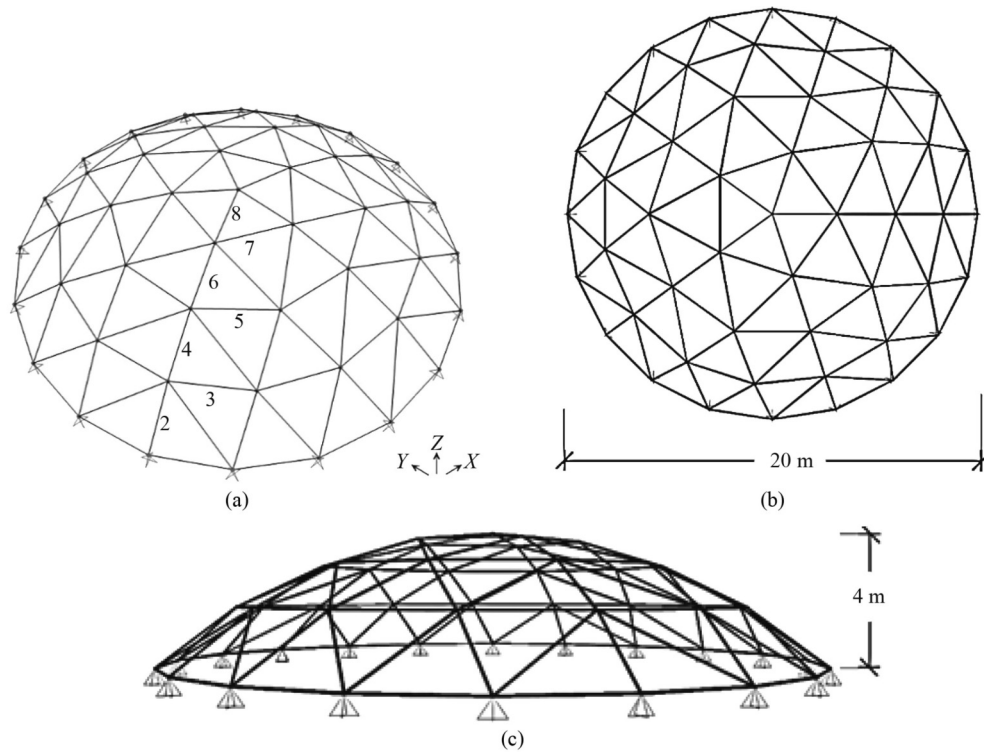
130-bar spatial steel dome structure. (a) 3D view and member grouping; (b) top view; (c) elevation view.
